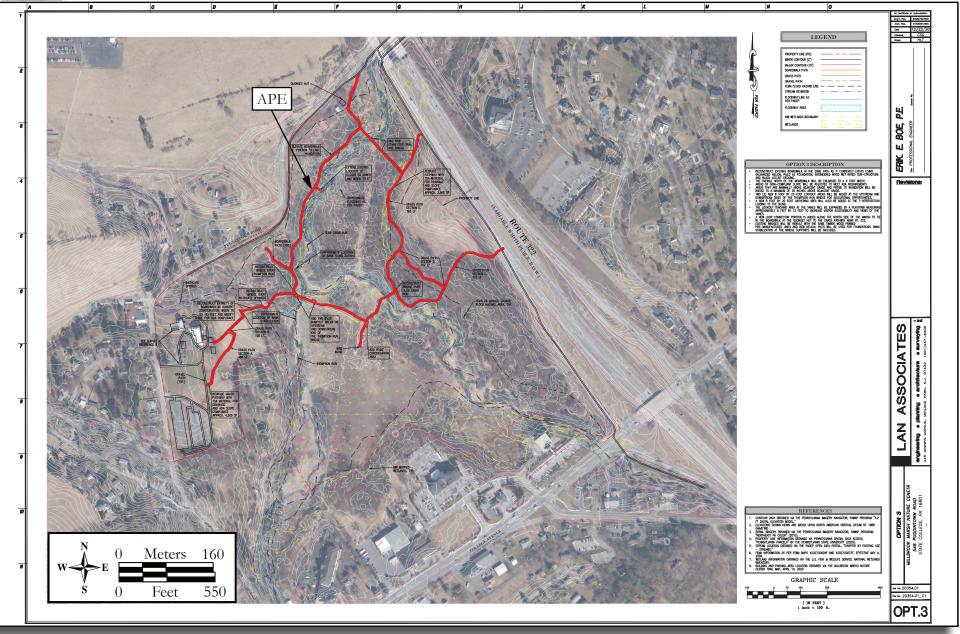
Proposed construction plans, Option 3 (from Lan Associates).
